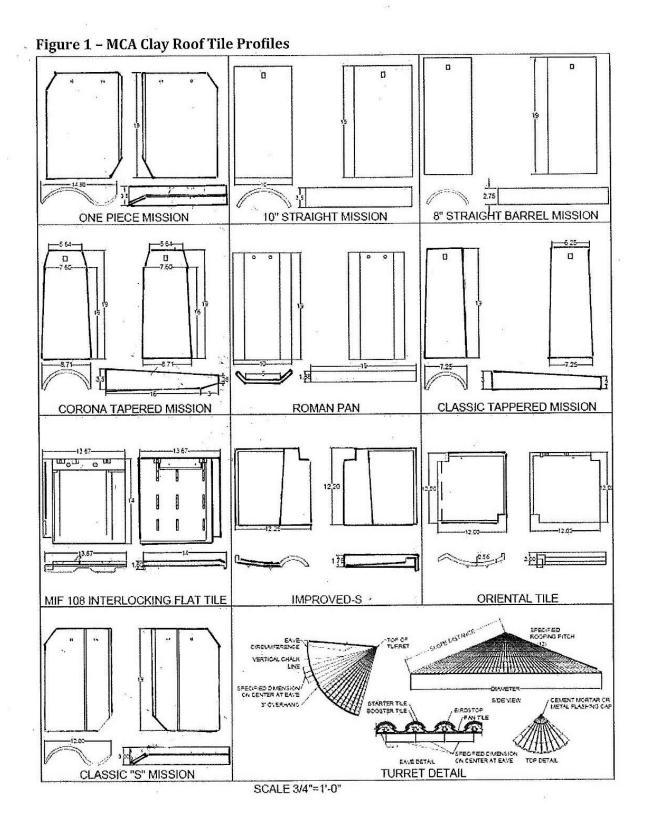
MCA Clay Roof Tile Profiles and Dimensions
